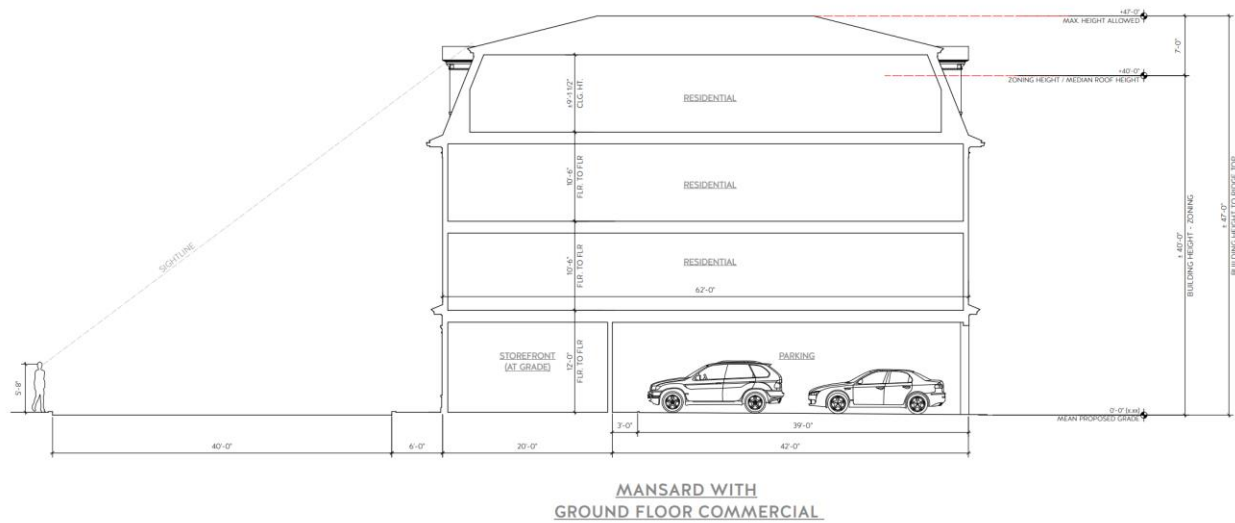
Proposed Elevations for the Portsmouth Steam Factory Building
